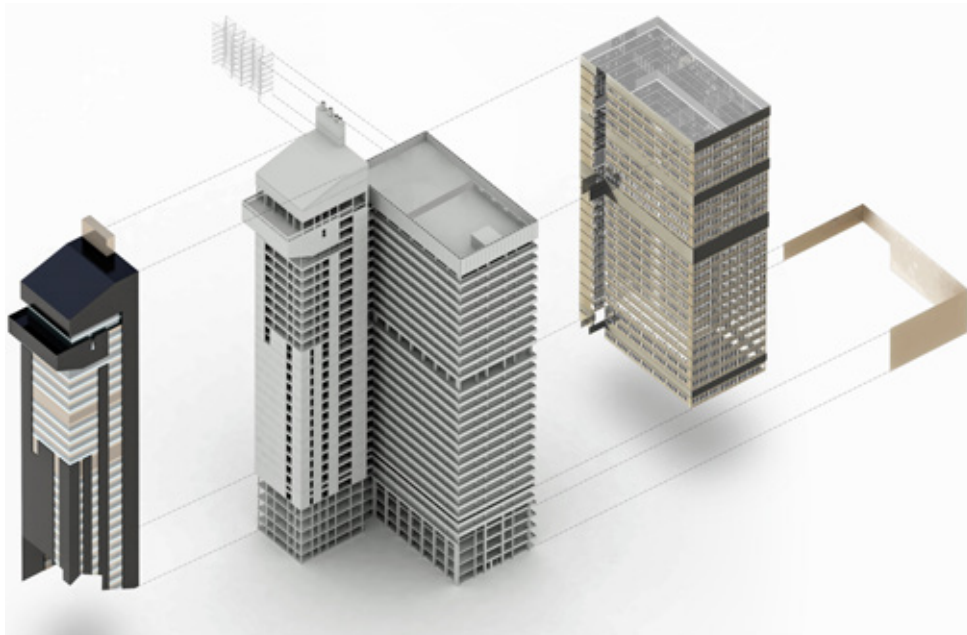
To refurbish Guy's Hospital Tower the precast concrete balconies needed to be cleaned and the exposed concrete structure needed to be insulated
